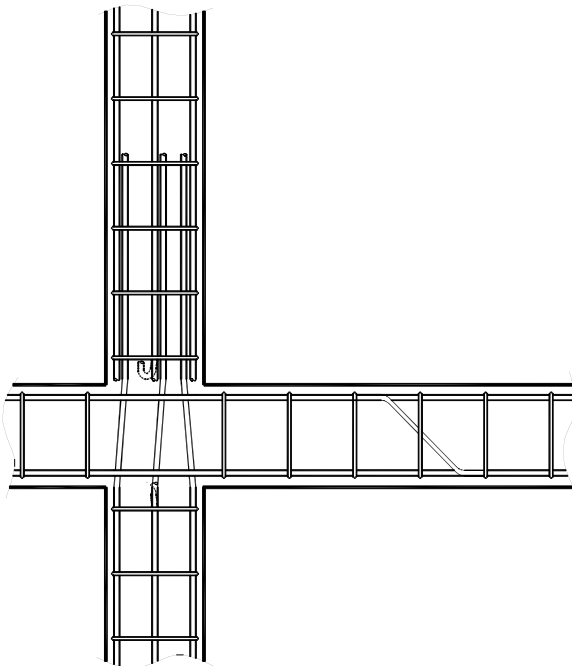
Typical beam and column reinforcing bar details in the damaged RC buildings during 1999 Kocaeli earthquake [Sezen et al., 2000]
